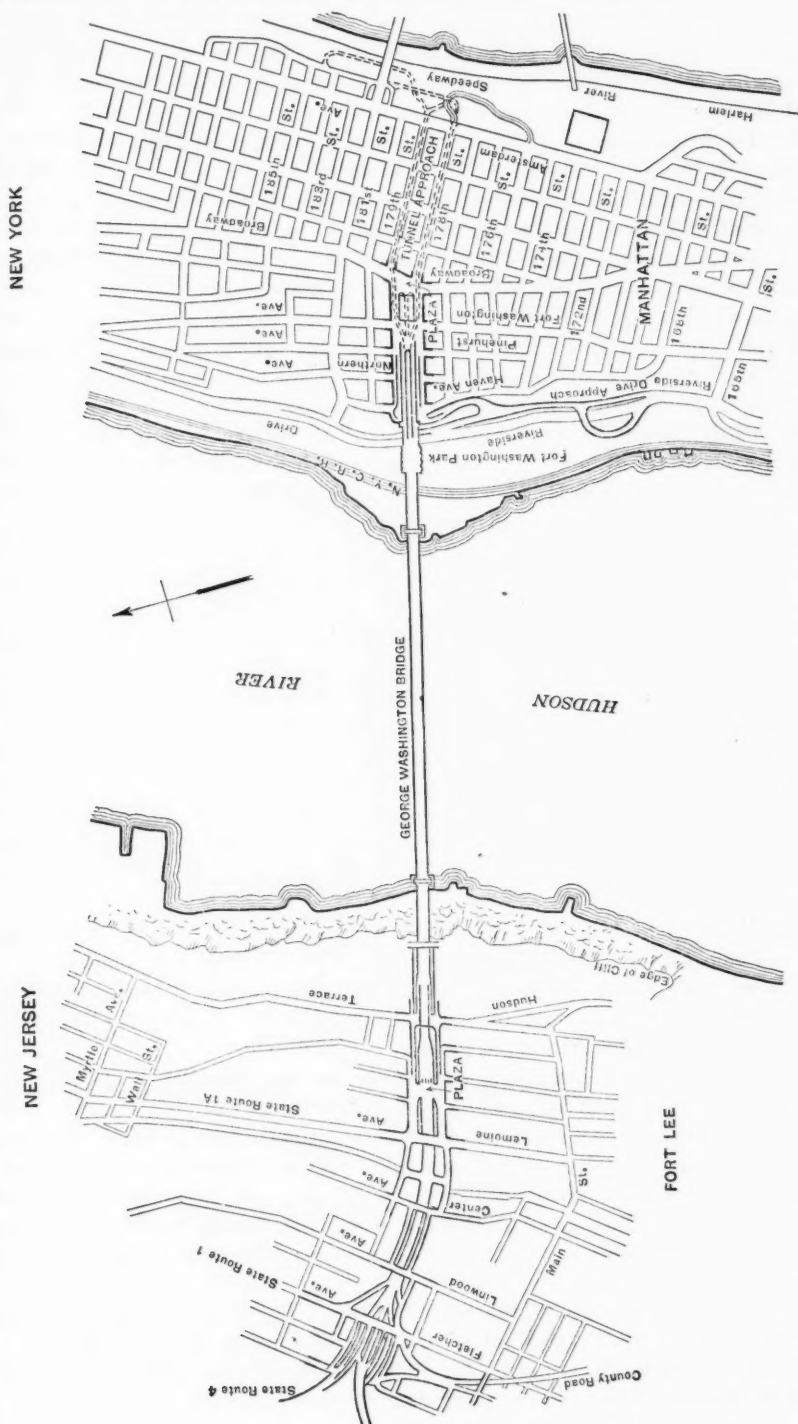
LOCATION MAP OF GEORGE WASHINGTON BRIDGE AND HIGHWAY APPROACHES.
